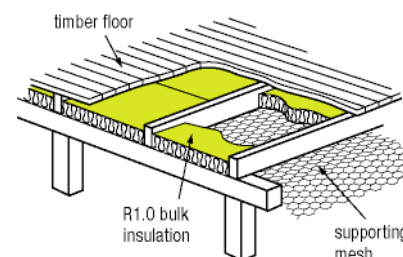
Suspended timber floor with bulk insulation between the joists and supporting mesh (overall R value at least 1.3)
